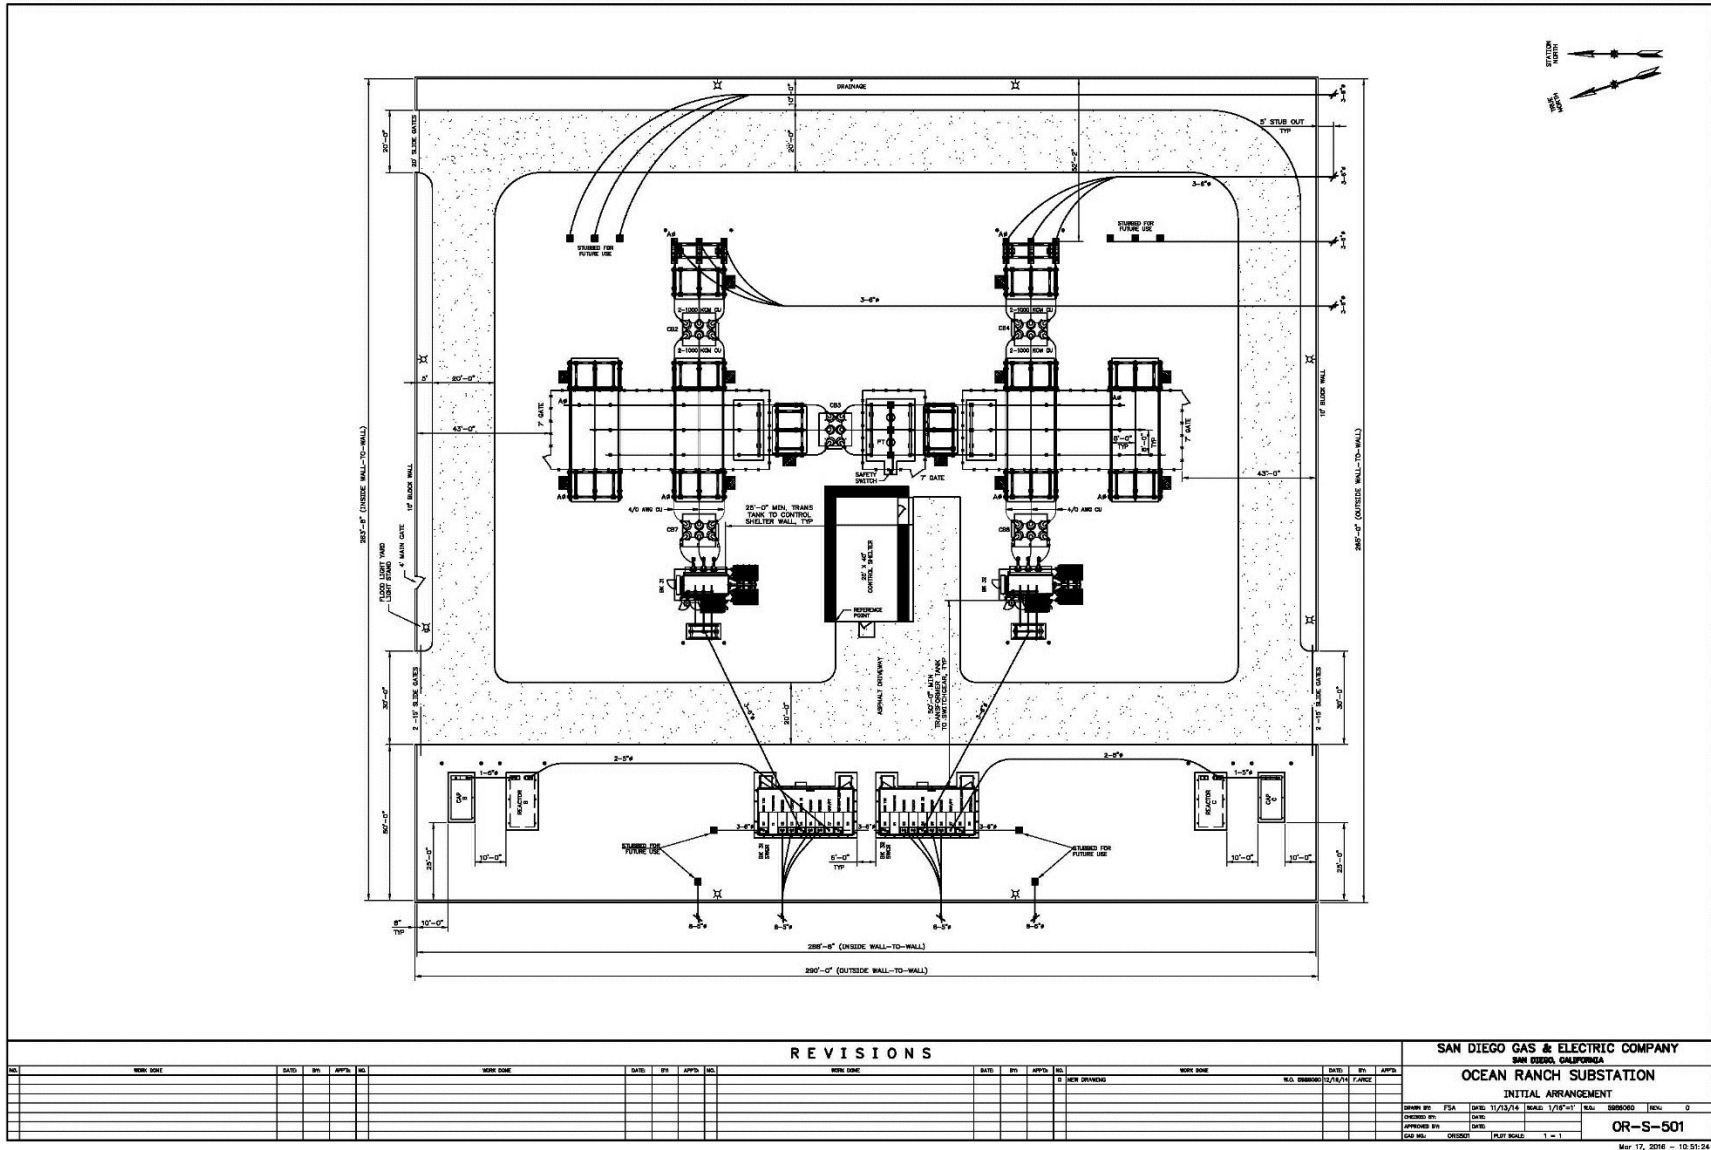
Proposed Ocean Ranch Substation Initial Arrangement
